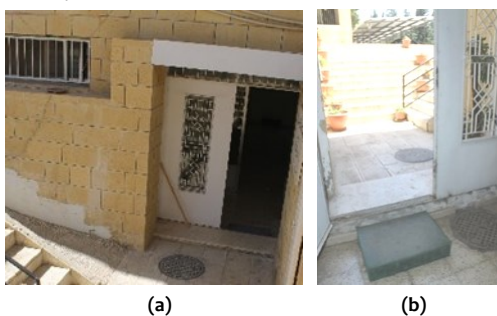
(a) The ramp leading to the basement of building 'A' (Author); (b) The basement entrance with two steps (Author)
